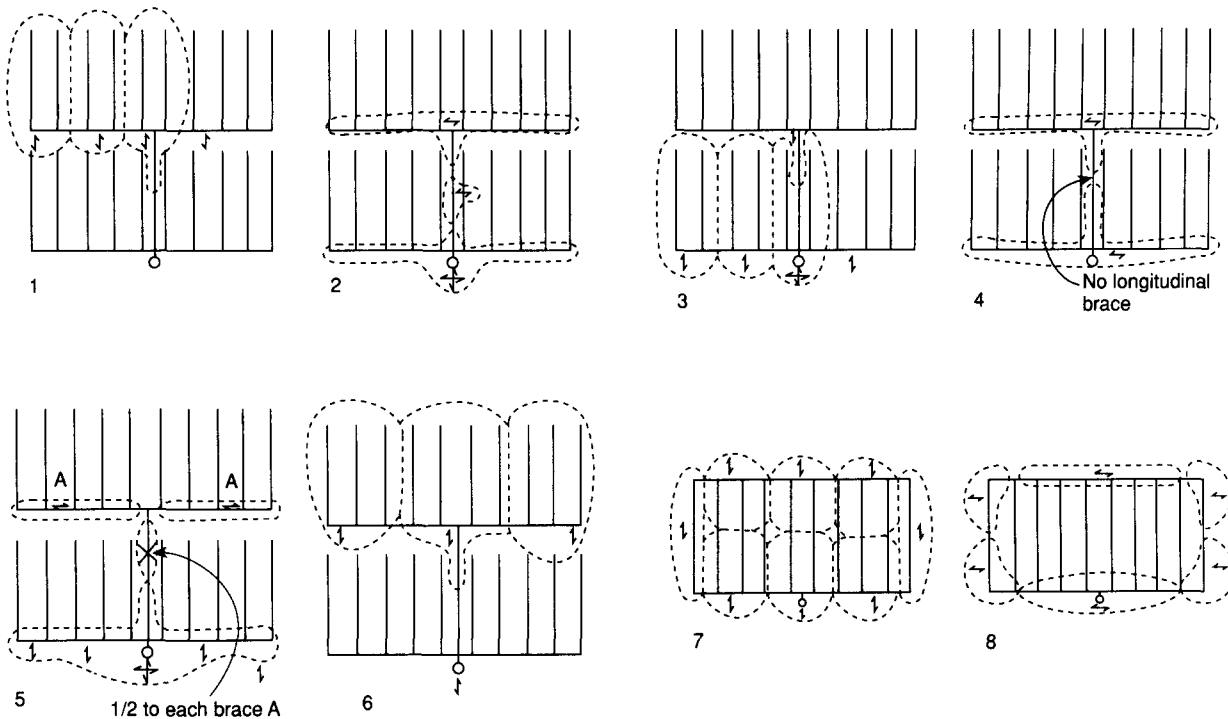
(h) Examples of load distribution to bracing.
